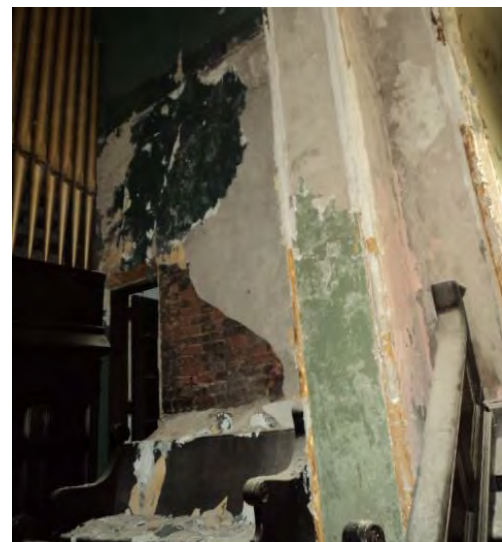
NW Balcony Area; ceiling damage.
